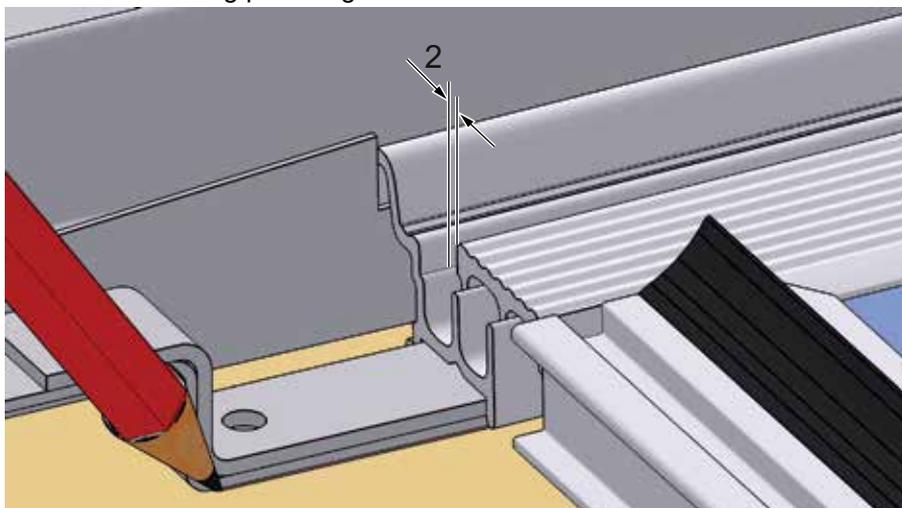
Marking the position of the left-hand edge of the mounting clamp
